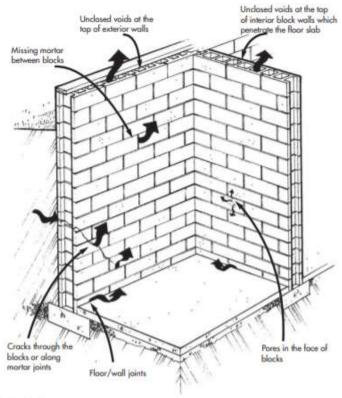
T Typical radon entry routes in concrete block foundation walls.
